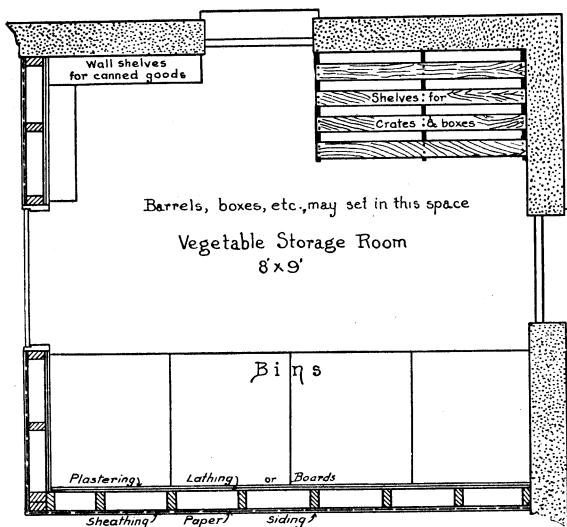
Floor plan of a storage room in a corner of a basement. The arrangement of the shelving and bins may be changed to suit conditions. While the construction of the wall may be varied, it must be tight.
